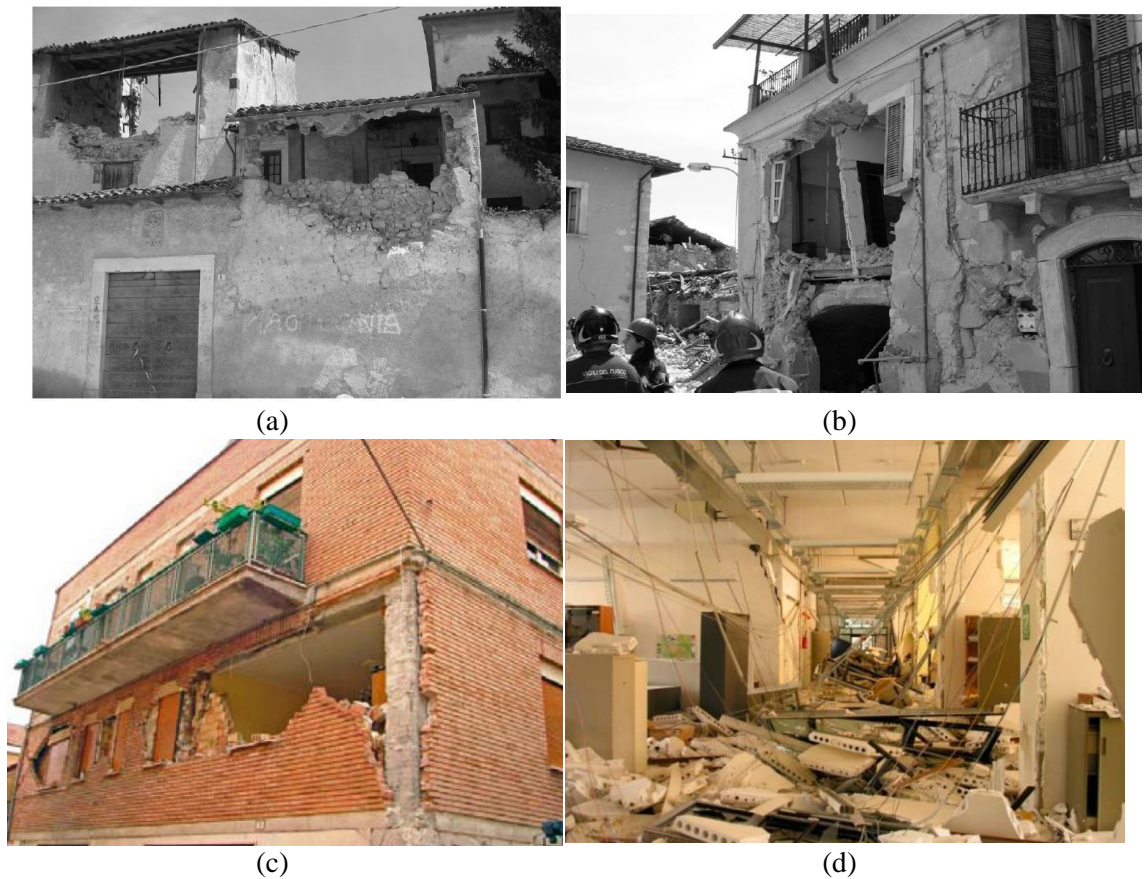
Examples of out-of-plane collapses of (a,b) external URM walls of traditional masonry structures (San Gregorio, Onna) (Oyarzo-Vera and Griffith, 2009) (c) infill walls and (d) internal partition walls (Bazzurro et al., 2009)
